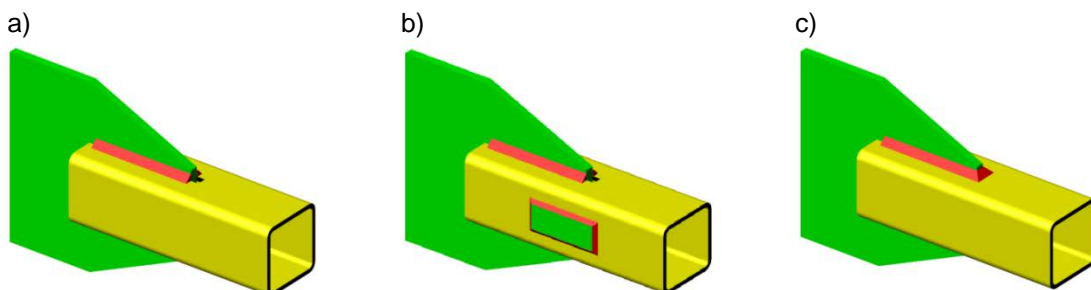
a) Conventional slotted tube-to-gusset plate connection, b) Connection reinforced with plate, c) Wrapped-around welds
